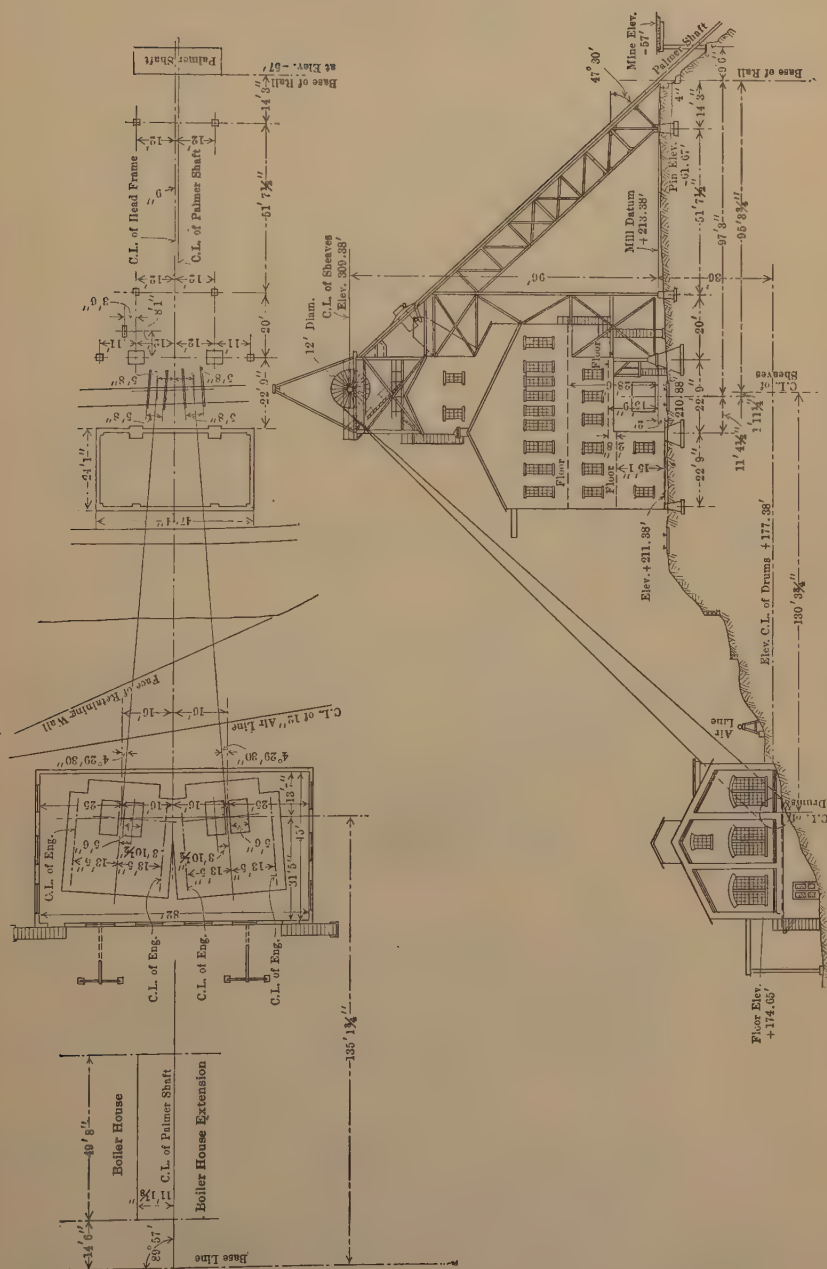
PALMER SHAFT; LOCATION OF HEADFRAME AND ENGINE HOUSE.
